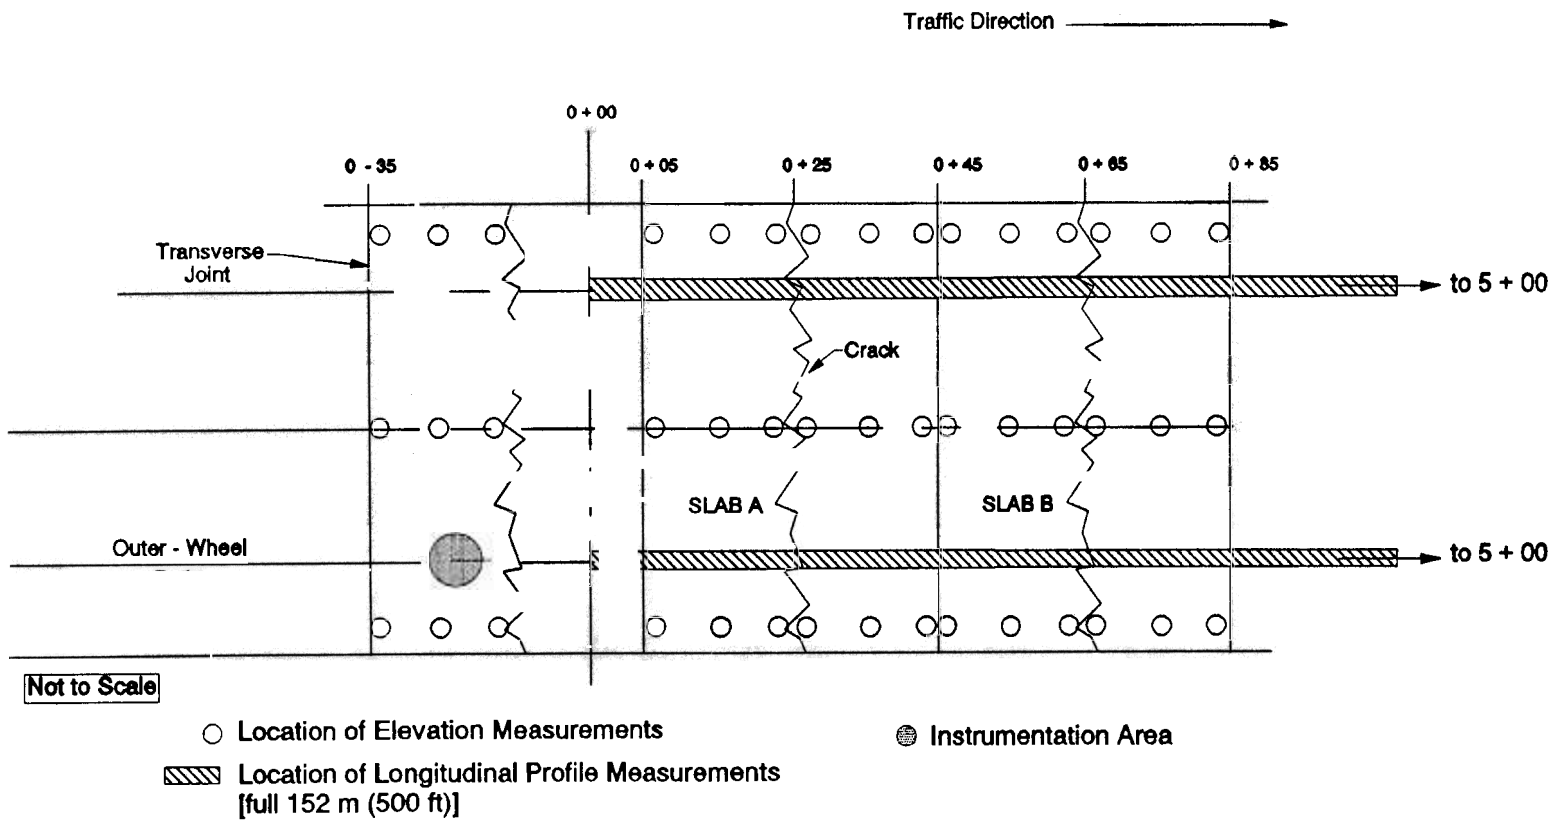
Elevation and Profile Data Collection Plan - AC Pavements
